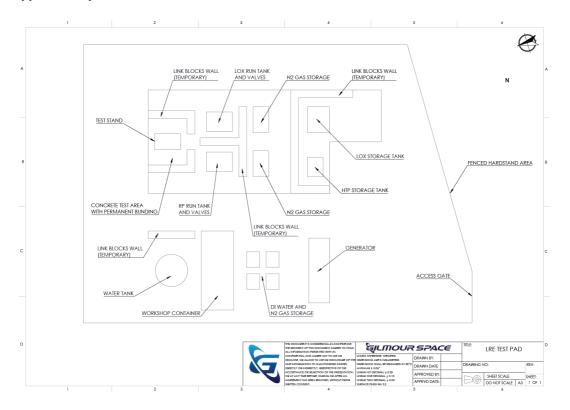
LRE Test Pad Typical Layout (Source: HDGMP prepared by Gilmour Space, refer to Appendix 10)
